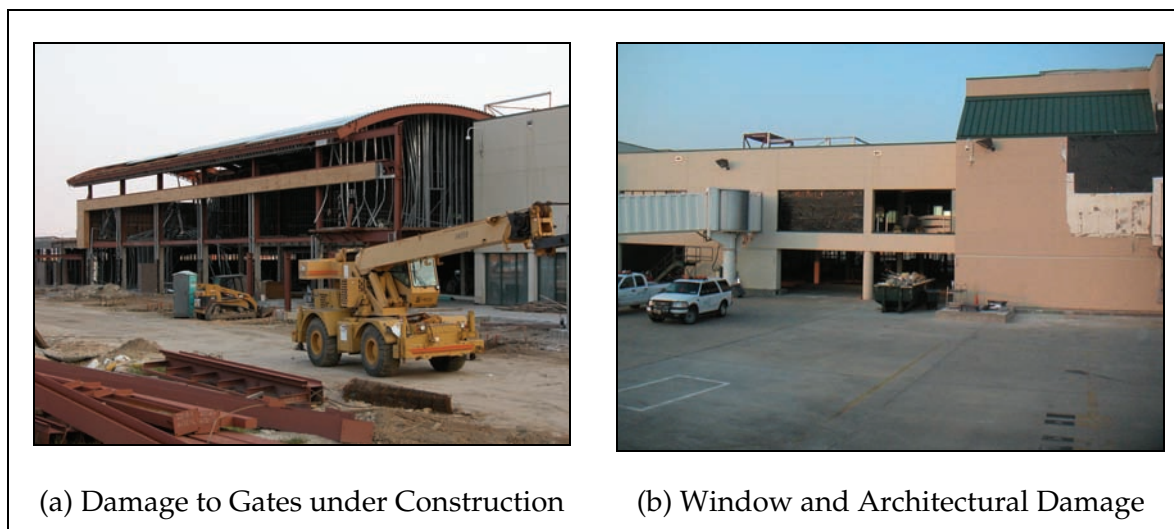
Gulfport-Biloxi airport was under construction and suffered damaged to existing and new gates.
